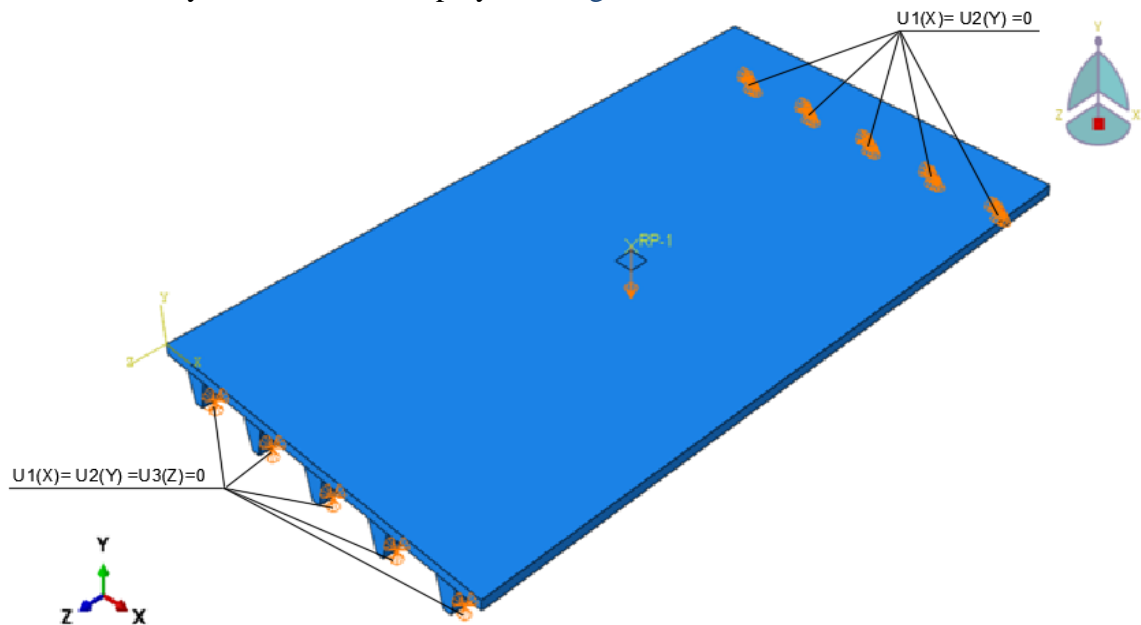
Boundary conditions and load application of composite slab in finite element model
